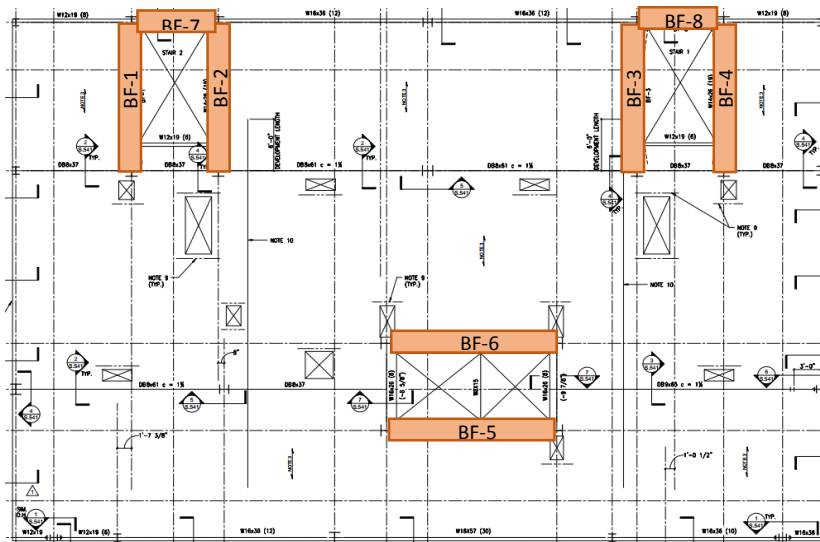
Typ. floor plan showing Lateral Force Resisting Elements (LFRE).
